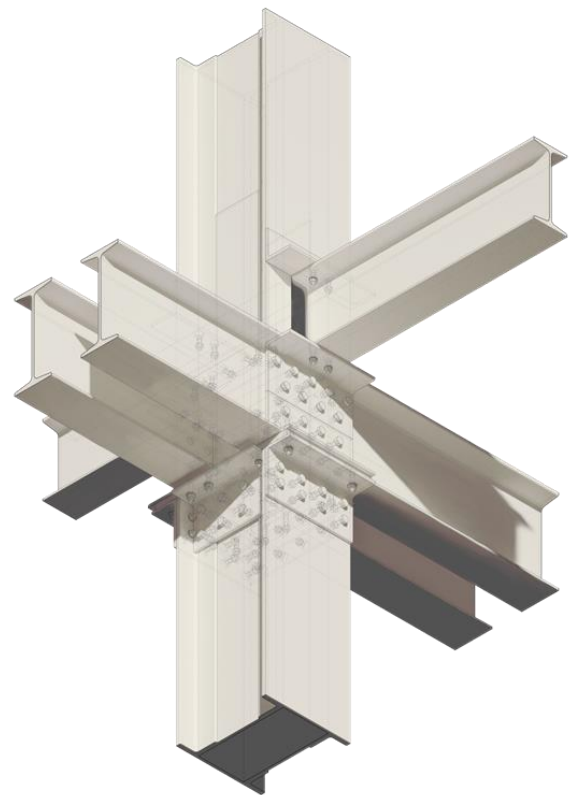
Axonometric view of a type of structural node with 6 elements, as imported from specific steel design BIM model
